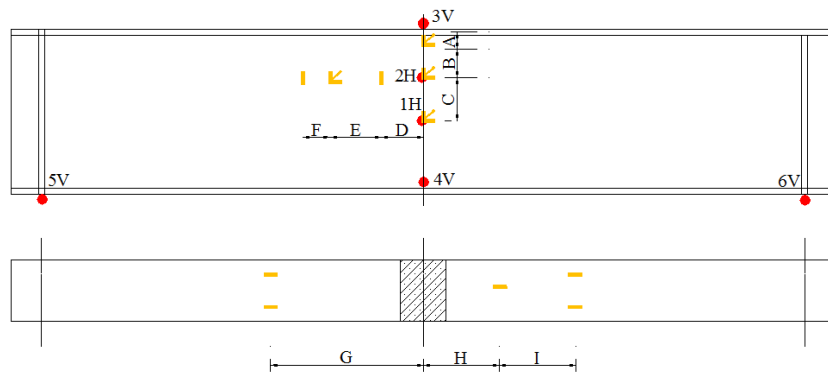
Instrumentation. Frontal and top views of tested girders $a/h_w > 2$
